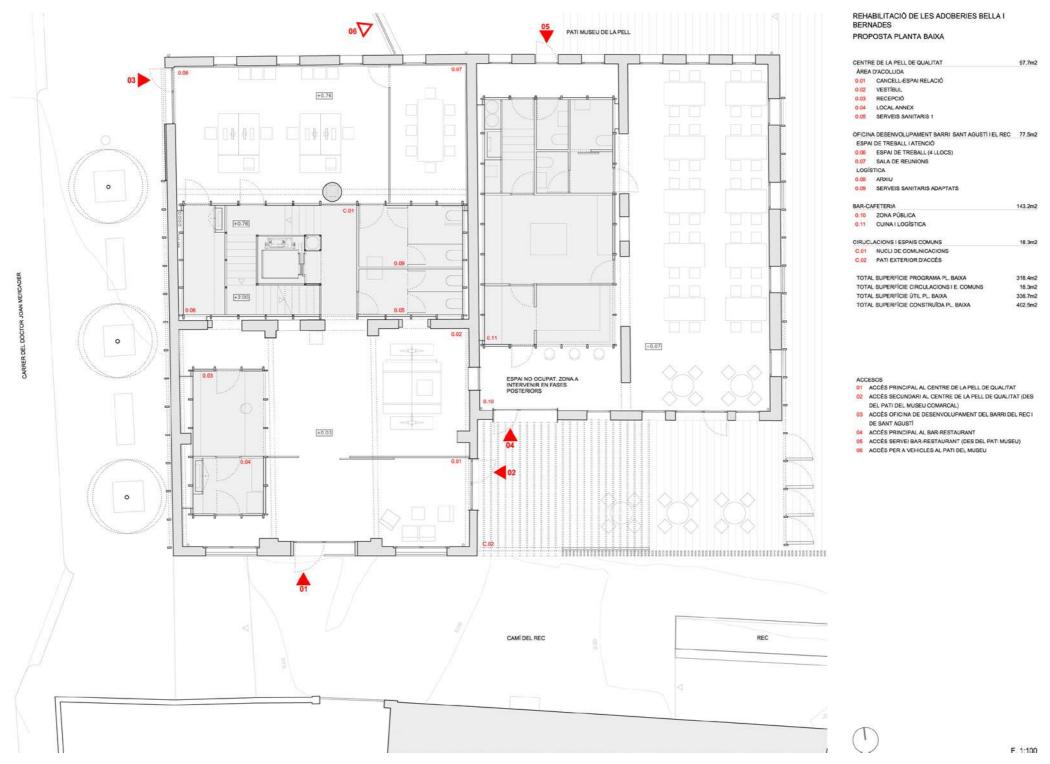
Ground-floor plan. © Taller 9s Arquitectes
